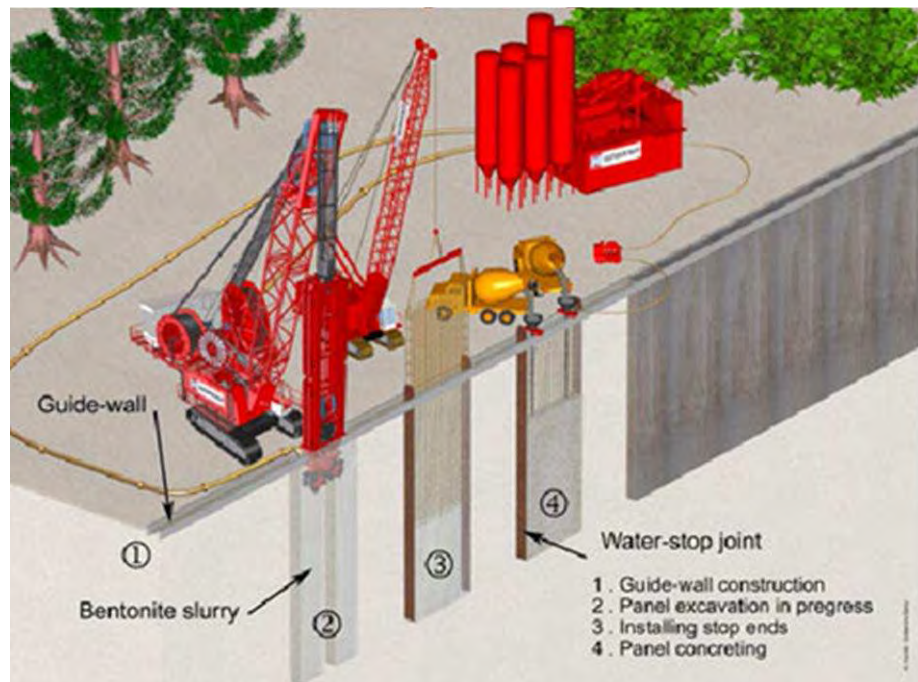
Construction of diaphragm wall. From Soletanche Bachy (2010).
